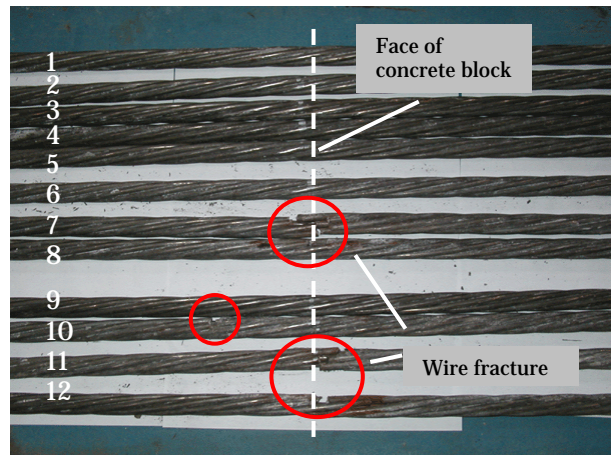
Demolition of Concrete Anchor Block for Tendon 01
